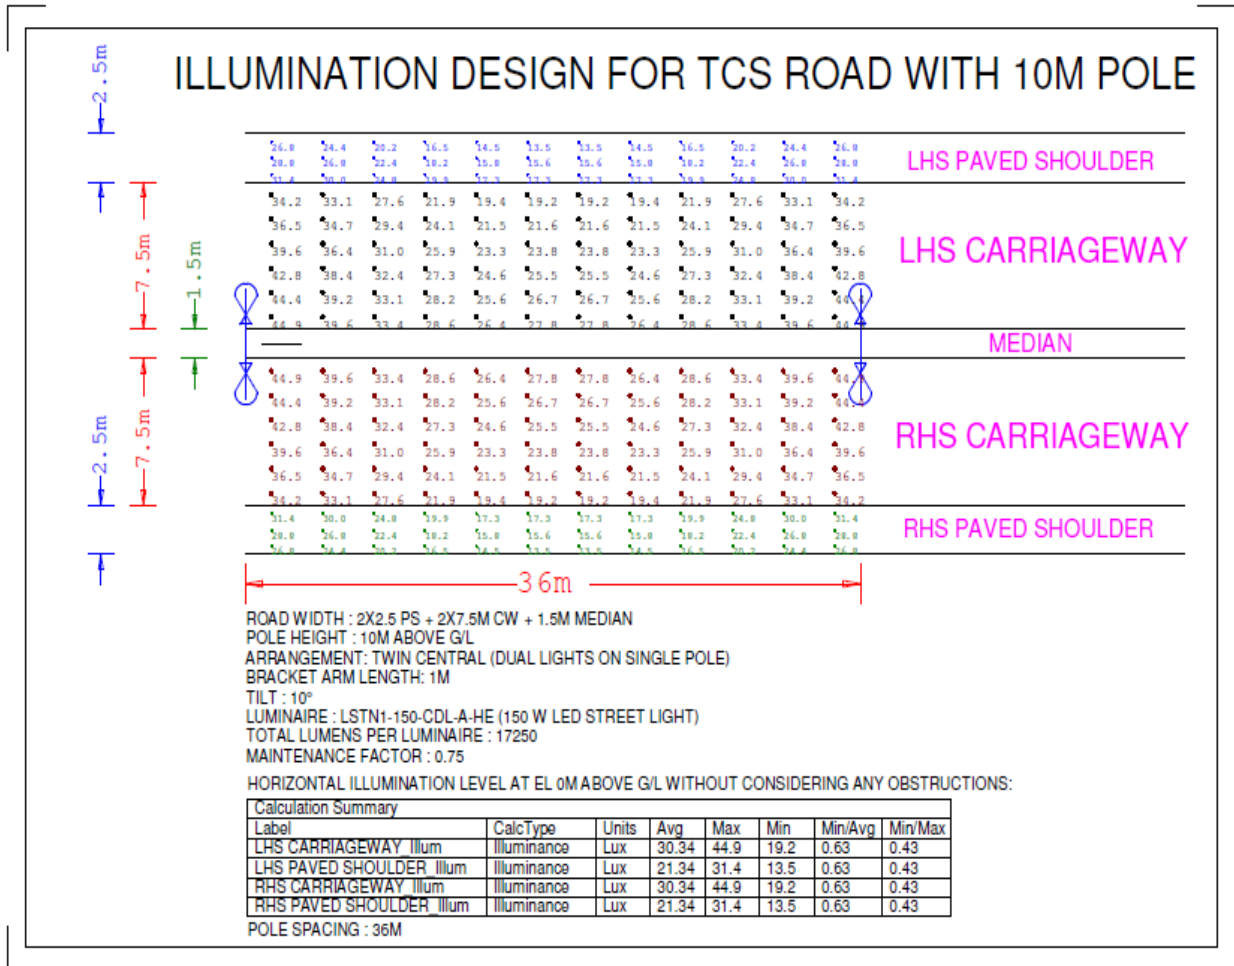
Road Lighting Design for 21.5M Width with LED
